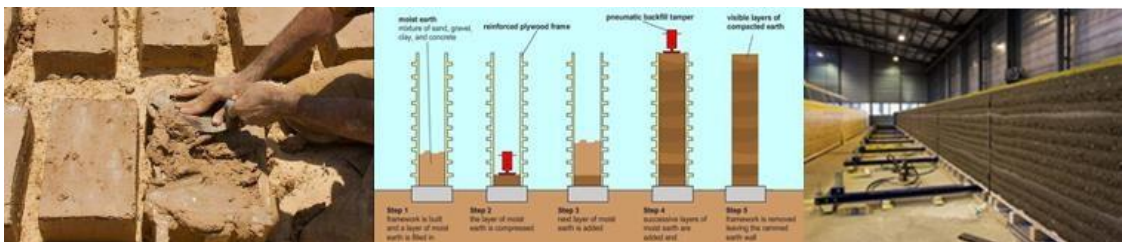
Mold block brick technique [14]; Figure 5. Rammed earth [15]; Figure 6. Prefabricated wall [16]
